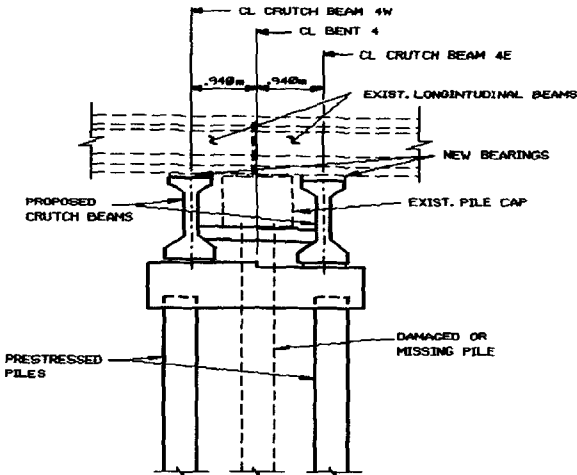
TYPICAL CRUTCH BENT DETAIL
